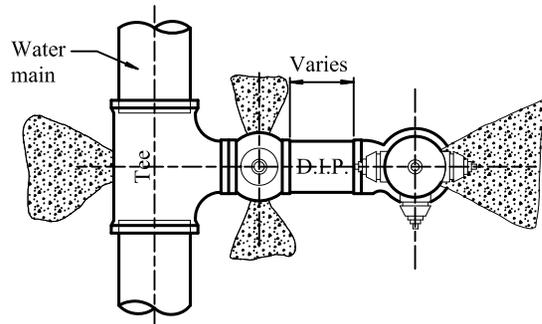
STANDARD DETAIL ENGLISH	DRY BARREL FIRE HYDRANT INSTALLATION	REVISED 04-27-2011	DETAIL NO. 360-1
